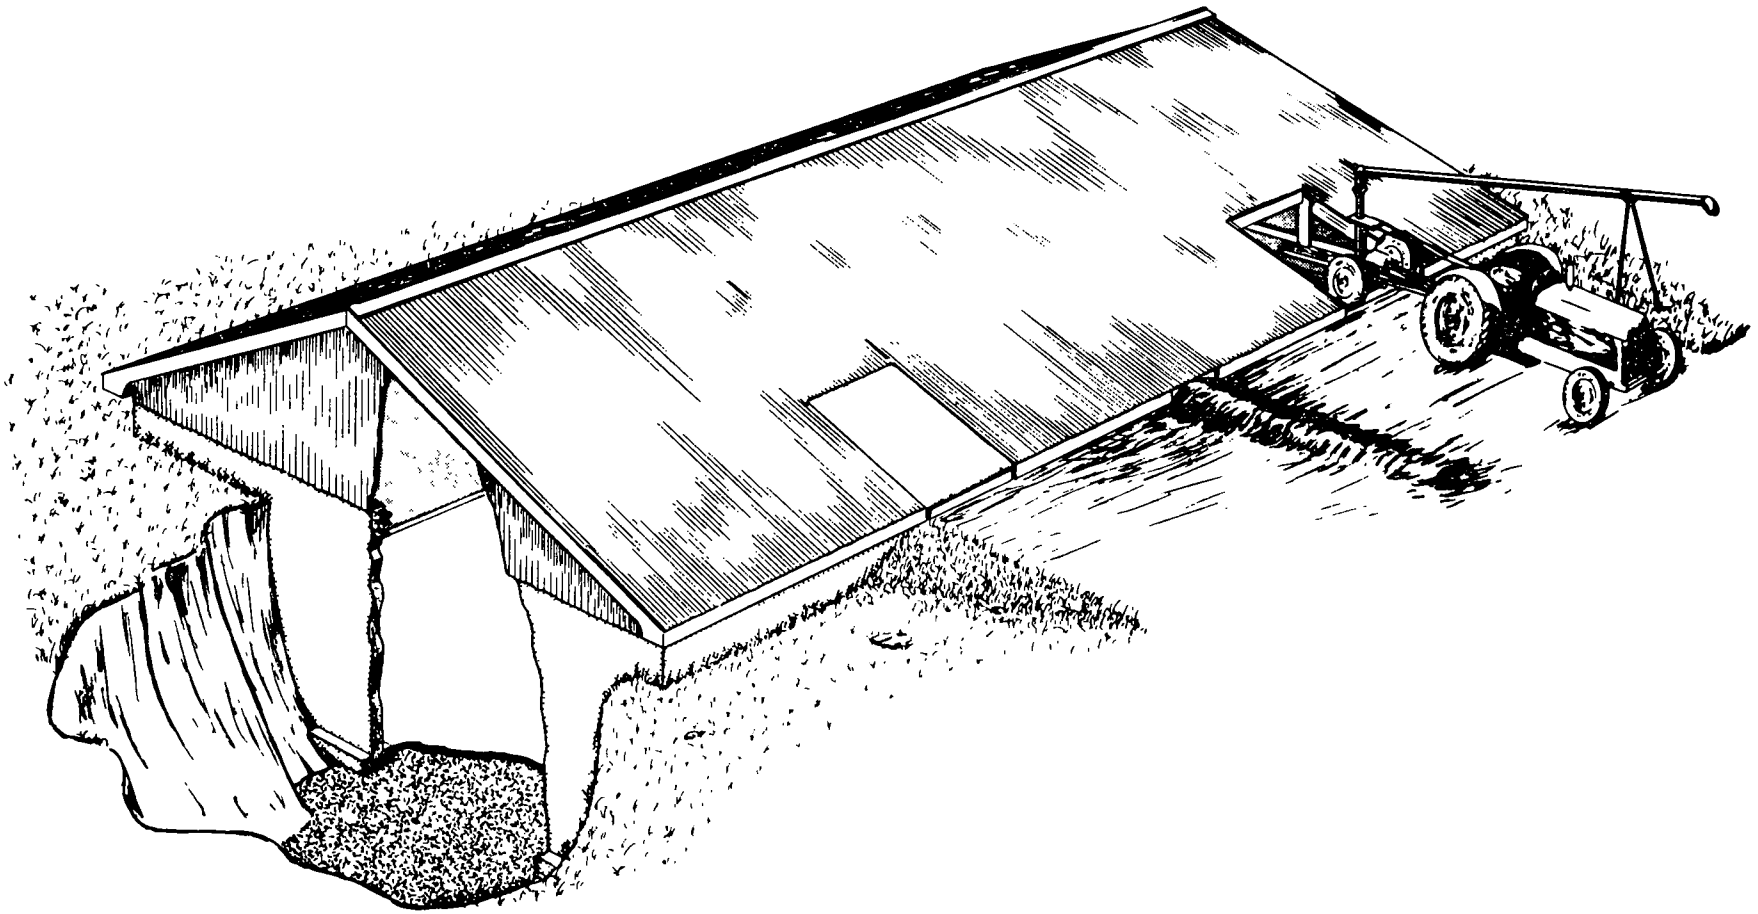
Rectangular Roofed Manure Tank (CPS Plan 3253)
